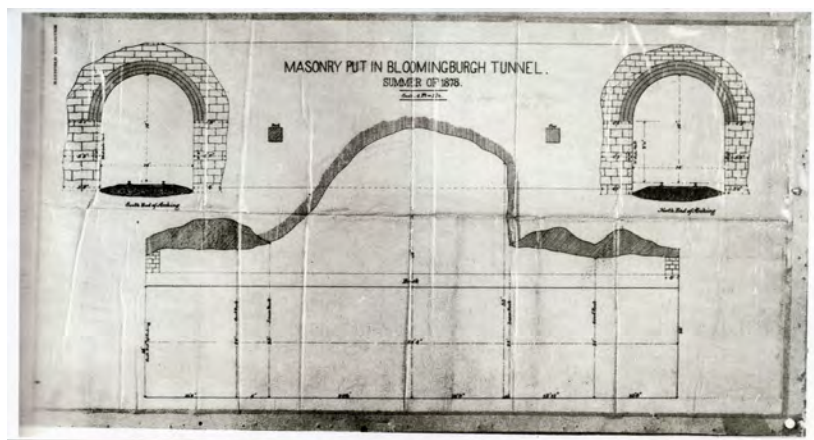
Engineering department drawing showing details of brick lining built to protect trains from persistent roof rock-falls in the O&W's High View-Wurtsville ("Bloomingburgh") tunnel. The August 30, 1878, Liberty (NY) Register reported "the Midland is doing a good job in the tunnel, laying a solid brick arch which will make it save for all trains to come" (Wakefield, 1970, p. 47).
